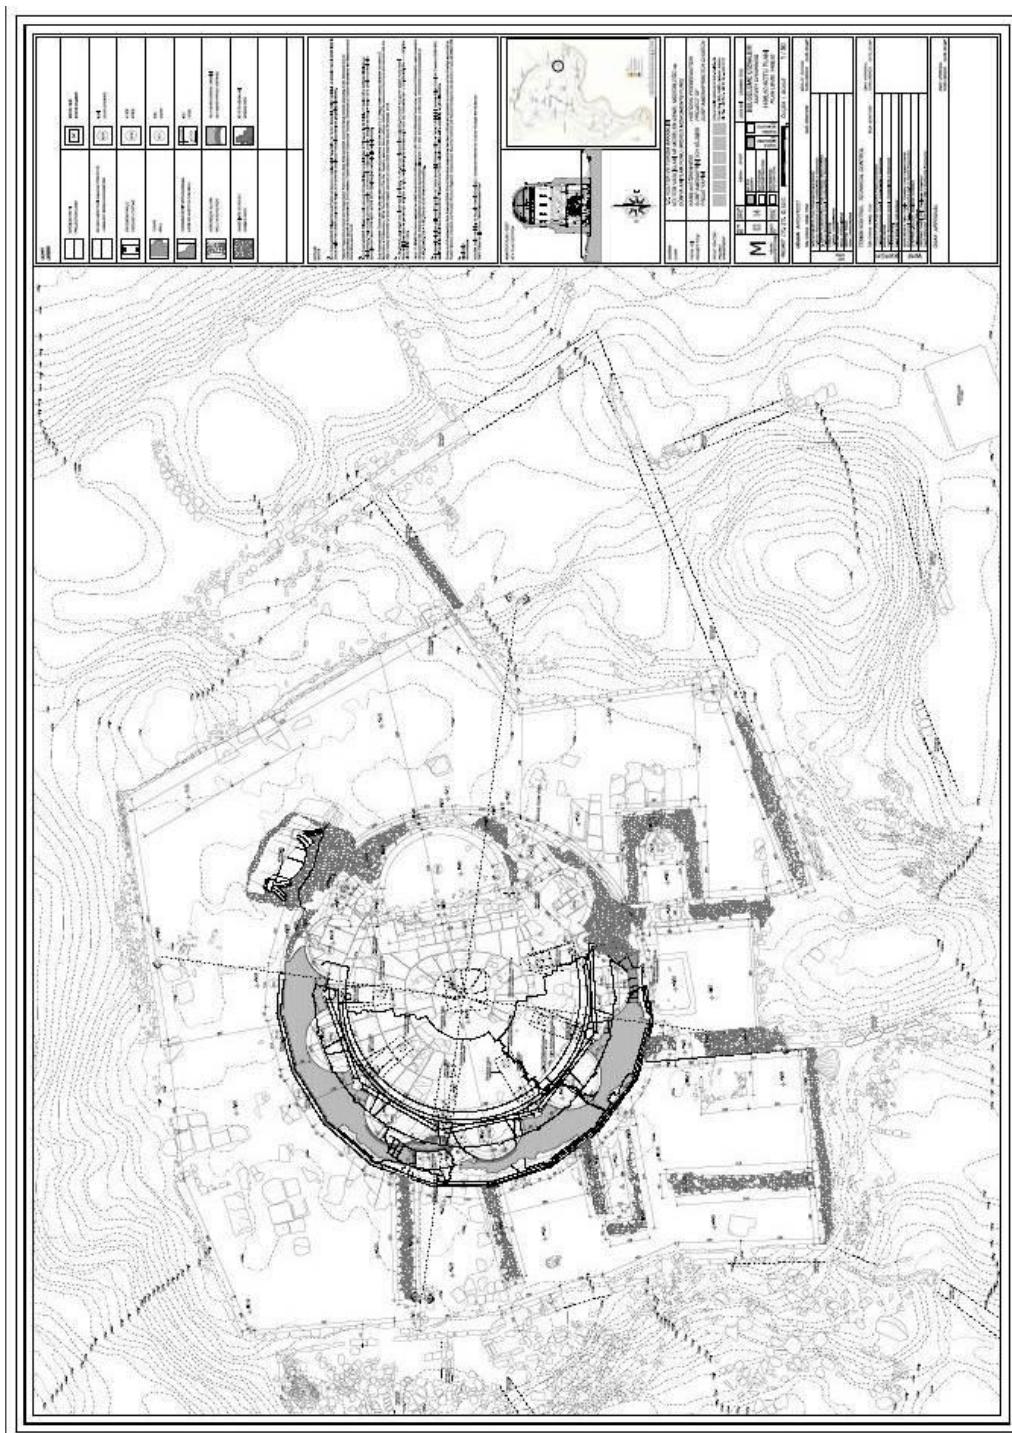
Plan at level +1491, Historic Preservation Project of Surb Amena P'rkich Church, Promet Projek Ltd.Şti. 2012
